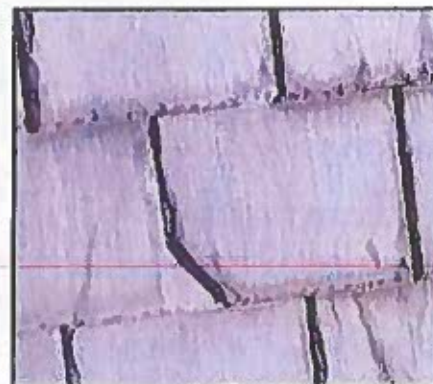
Slate defects - Broken corner. As break is not within 2" of joint between slates in course below, it can be left as is.
